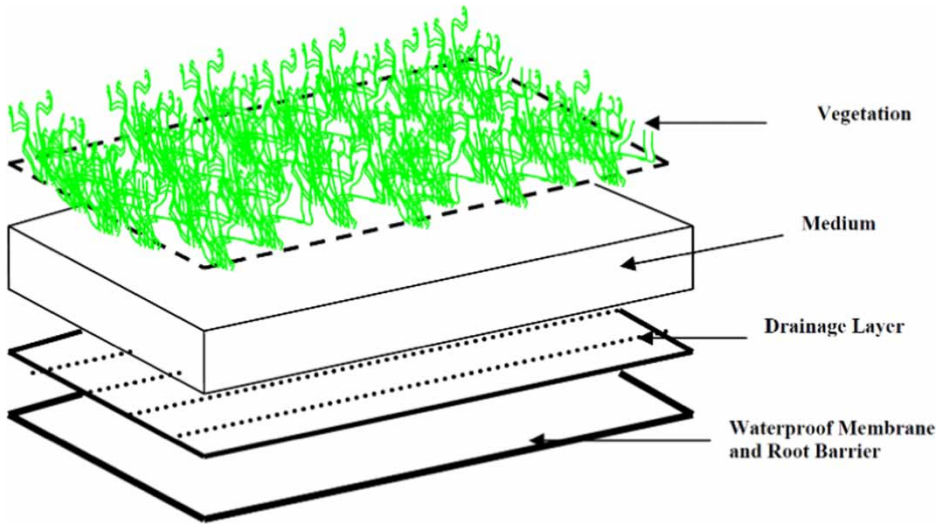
| Typical cross-section of a green roof system (Berghage *et al.* 2009).
